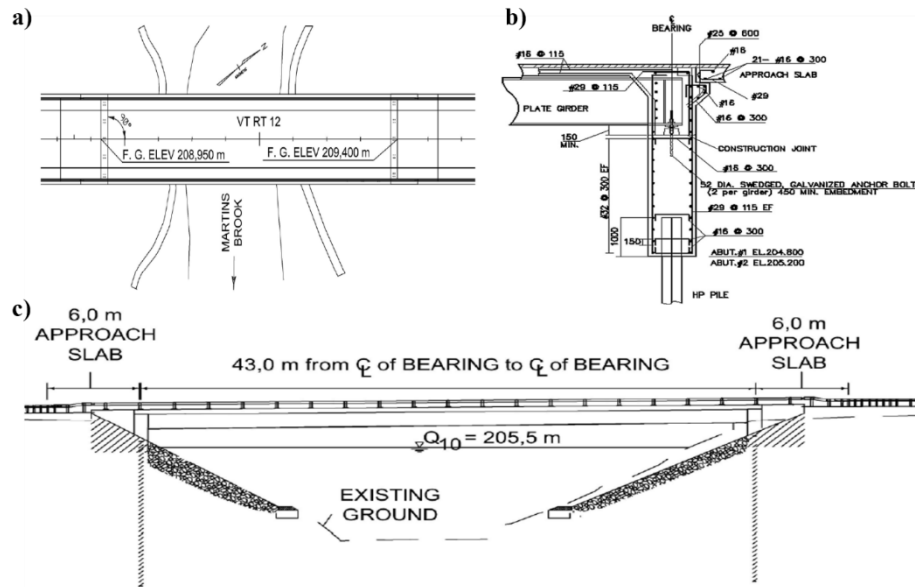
Bridge: (a) Plan view, (b) abutment cross-section, and (c) elevation view (Civjan et al. 2013)
